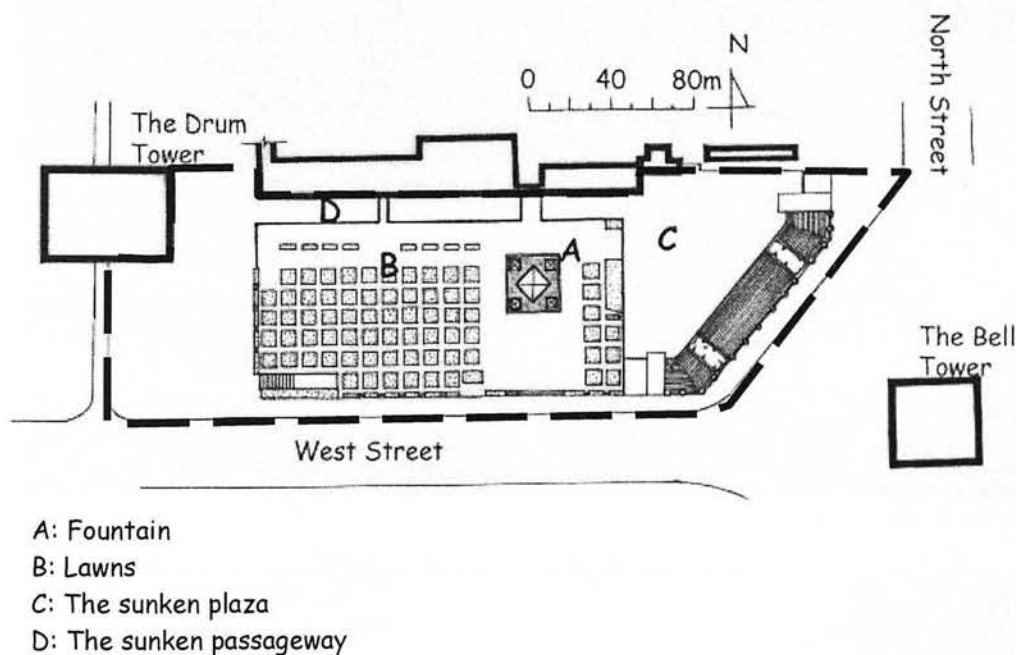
Site plan of the Ancient Tower Square, Xian
